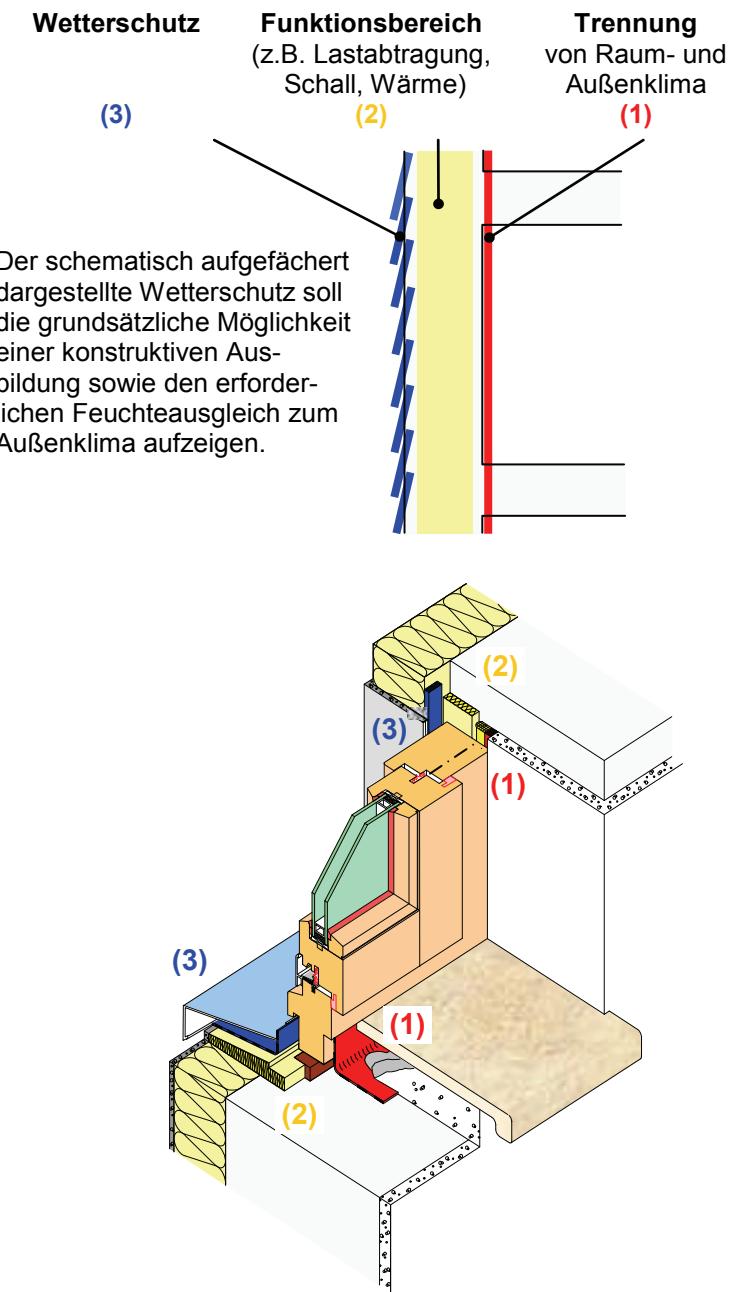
The plane model and transfer to the installation gap (applicable only conditionally to tropical/sub-tropical climatic zones).
